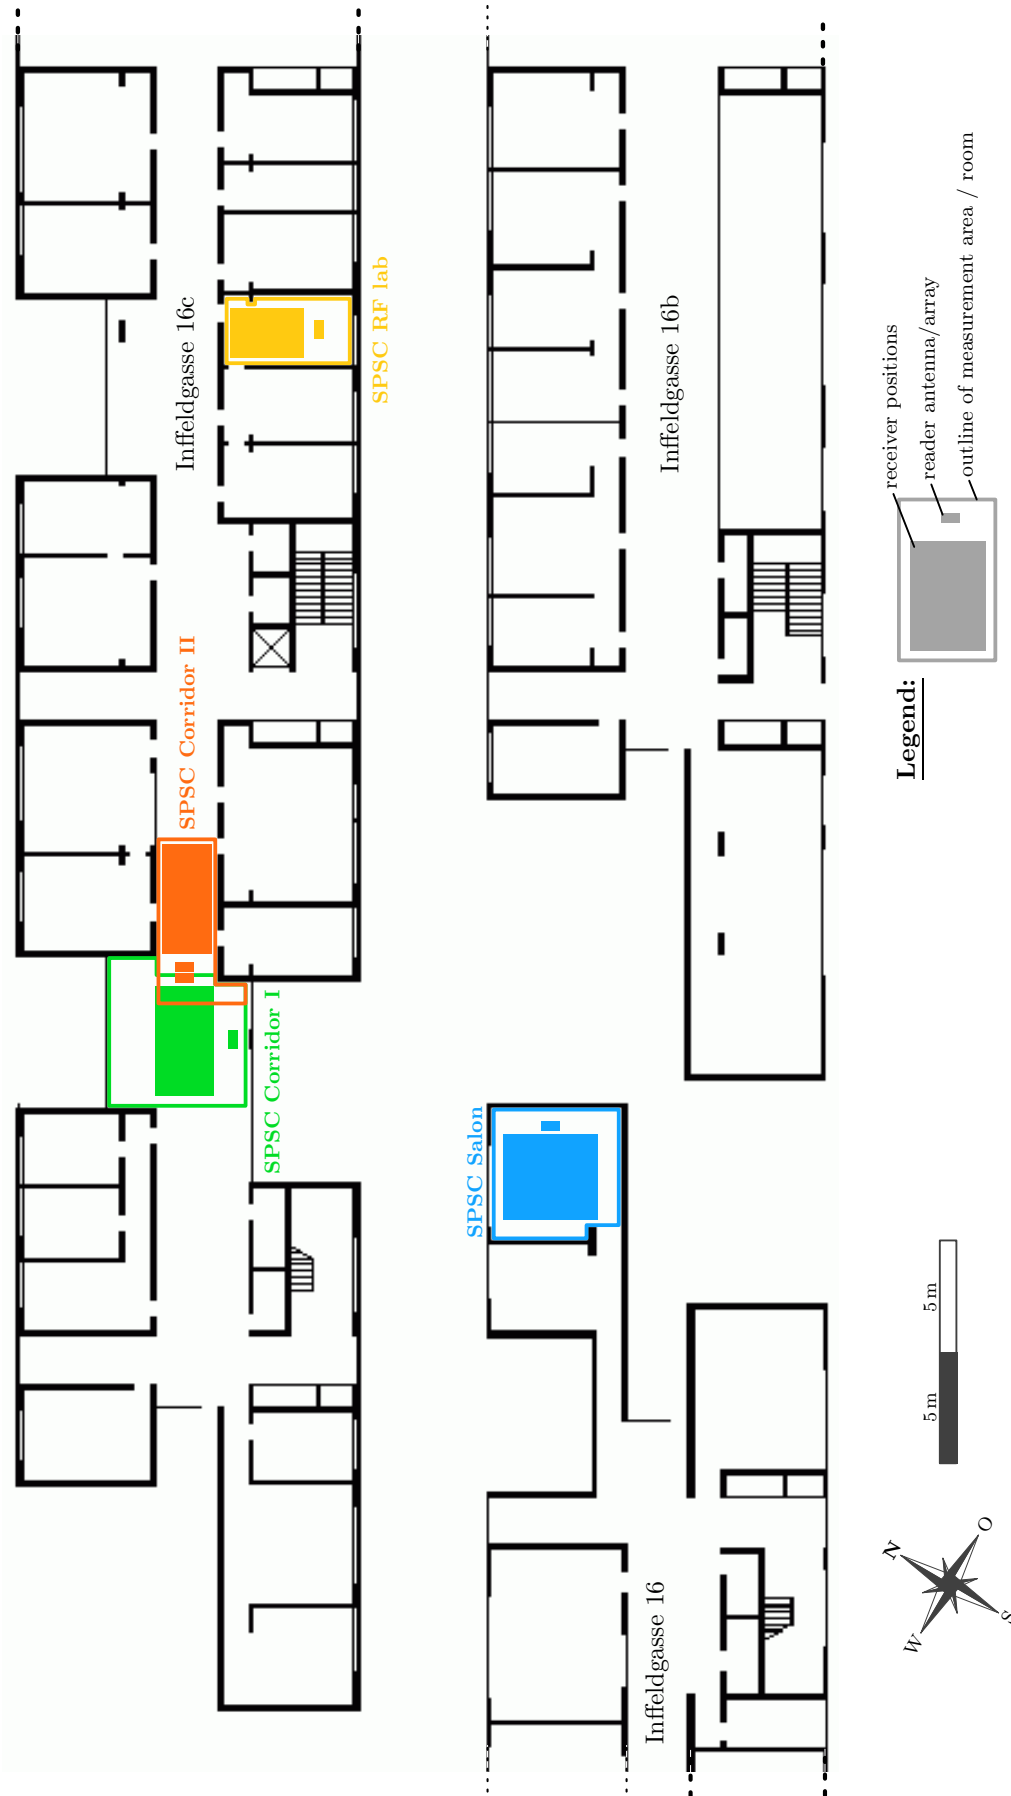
Floorplan of the buildings Inffeldgasse 16, 16b, and 16c (Graz Univ. of Technology) with marked measurement campaigns. Source of floorplan: <https://online.tugraz.at> (Apr. 2011).
